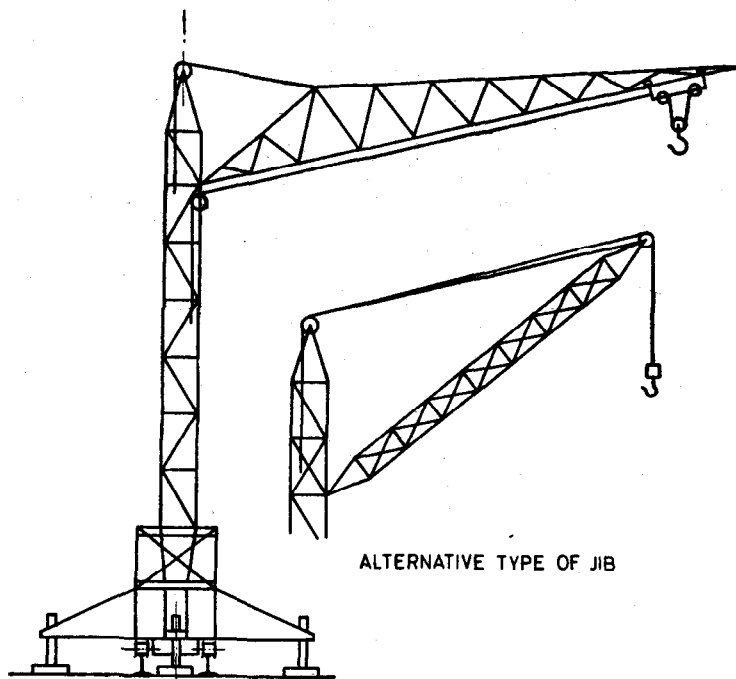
TOWER CRANE MOUNTED ON RAILS AND STABILIZED BY OUTRIGGERS
